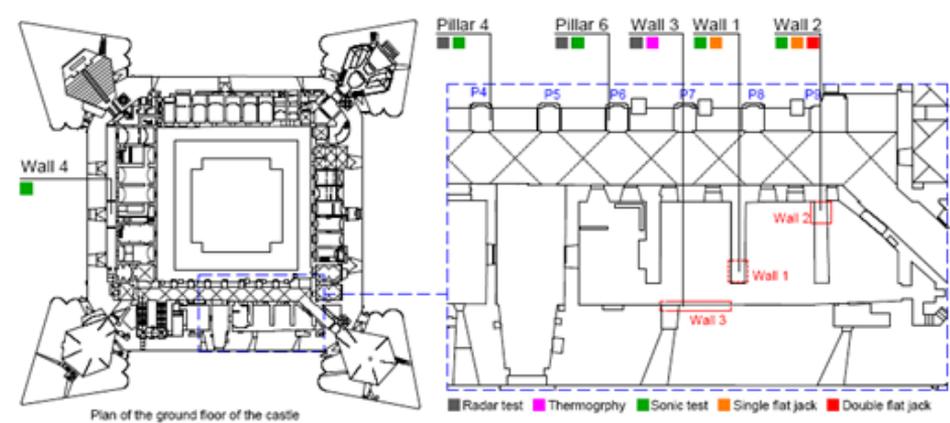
Plan of the Spanish fortress: position of the tests at the ground floor of the SE wing
